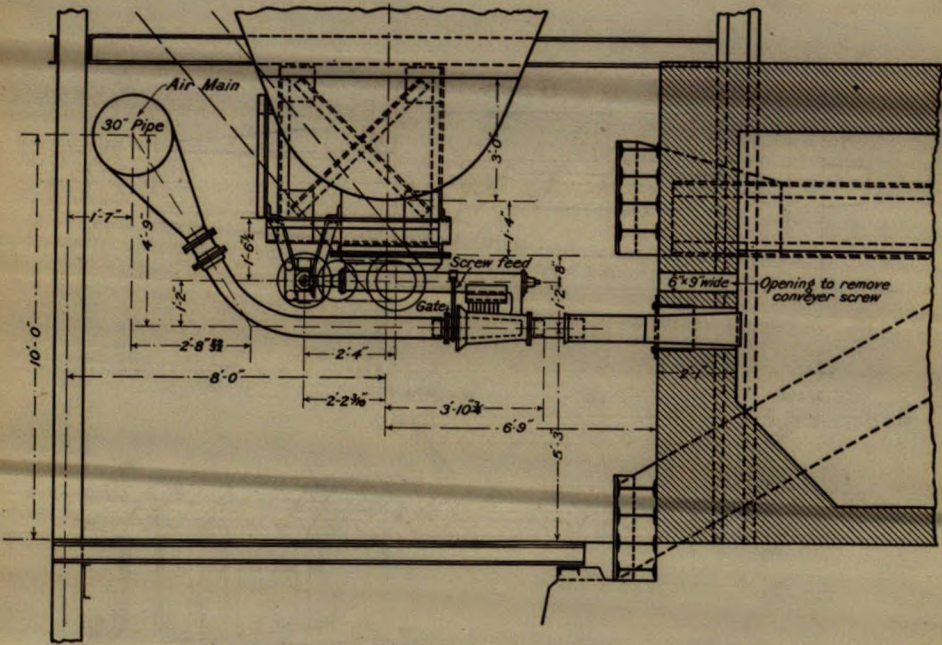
View showing bottom of coal bin, screw feed, air main and burner for the reverberatory plant at Anaconda.
